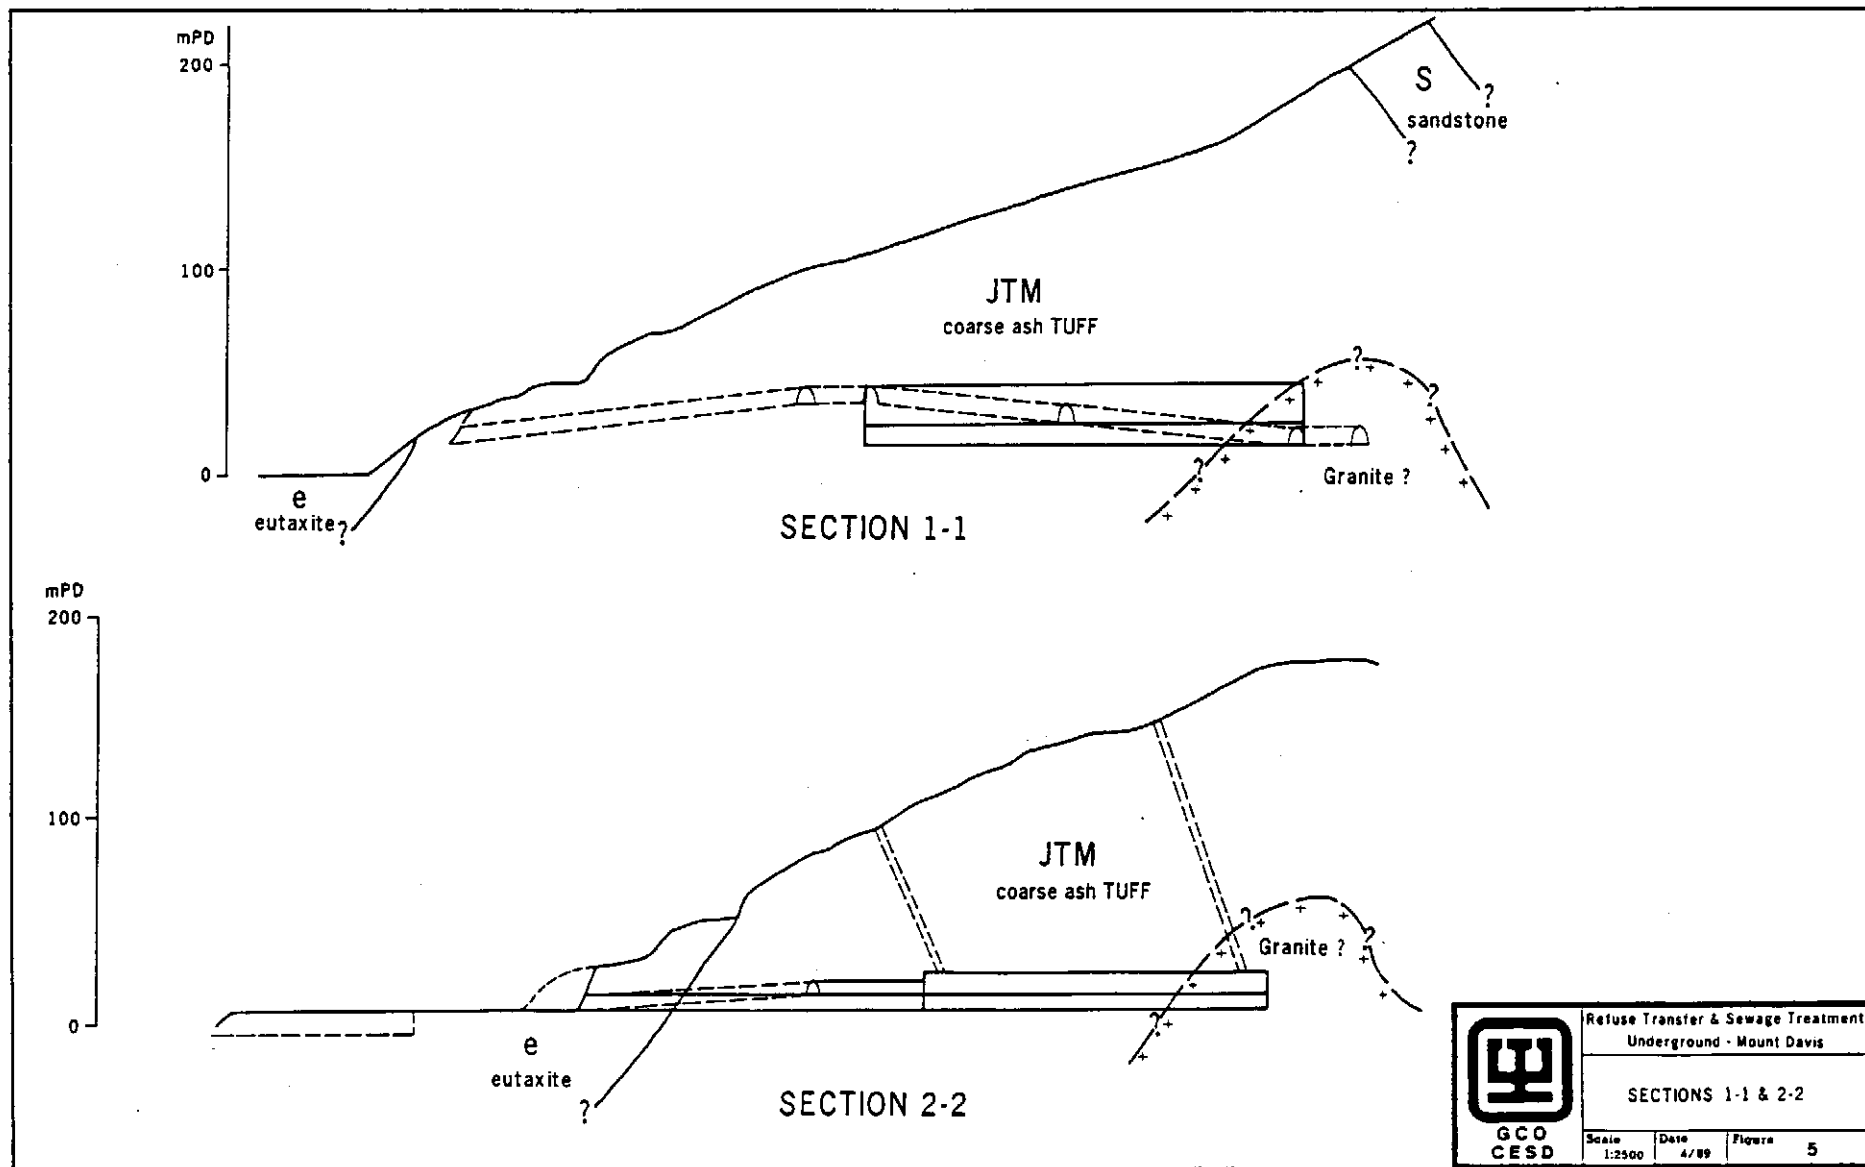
Cross-section - Proposed Mount Davis Underground Facilities
